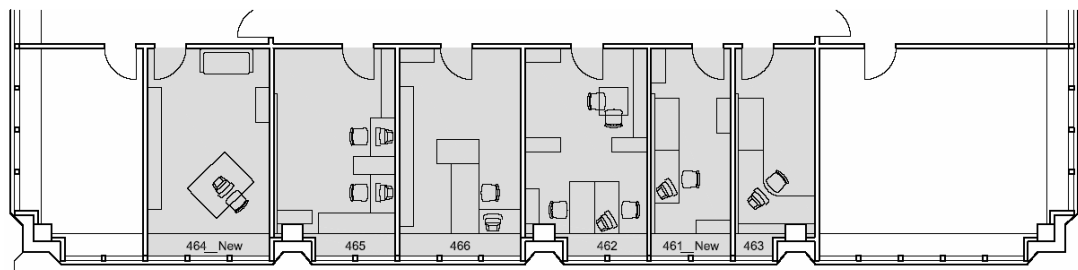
Schematic plan of the monitored rooms in the 6th floor
